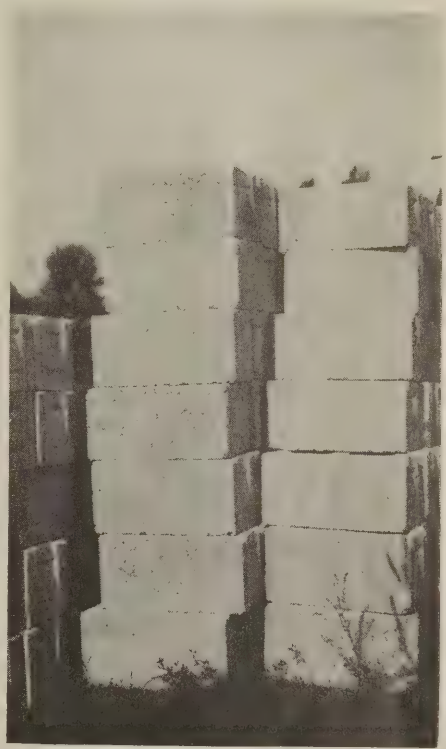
Flat rough surface concrete block specified for basement and stucco covered walls of the two residences
